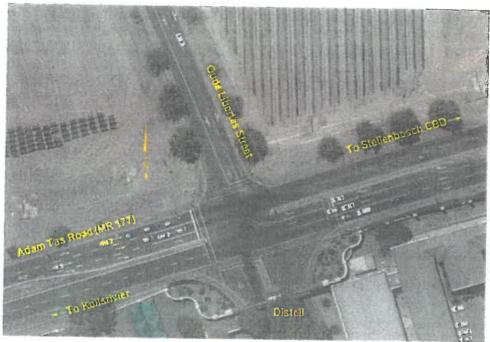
Existing Adam Tas Road/Oude Libertas Street intersection lane layout
